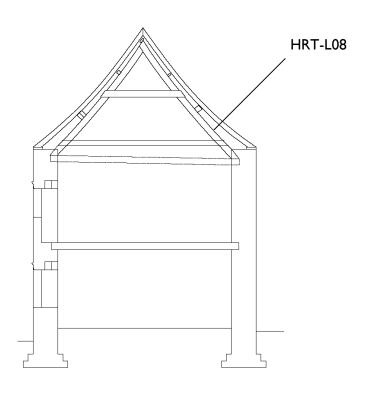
Truss 6 (west face), showing the location of sample HRT-L08 (Morton & Hall Consulting Ltd)
